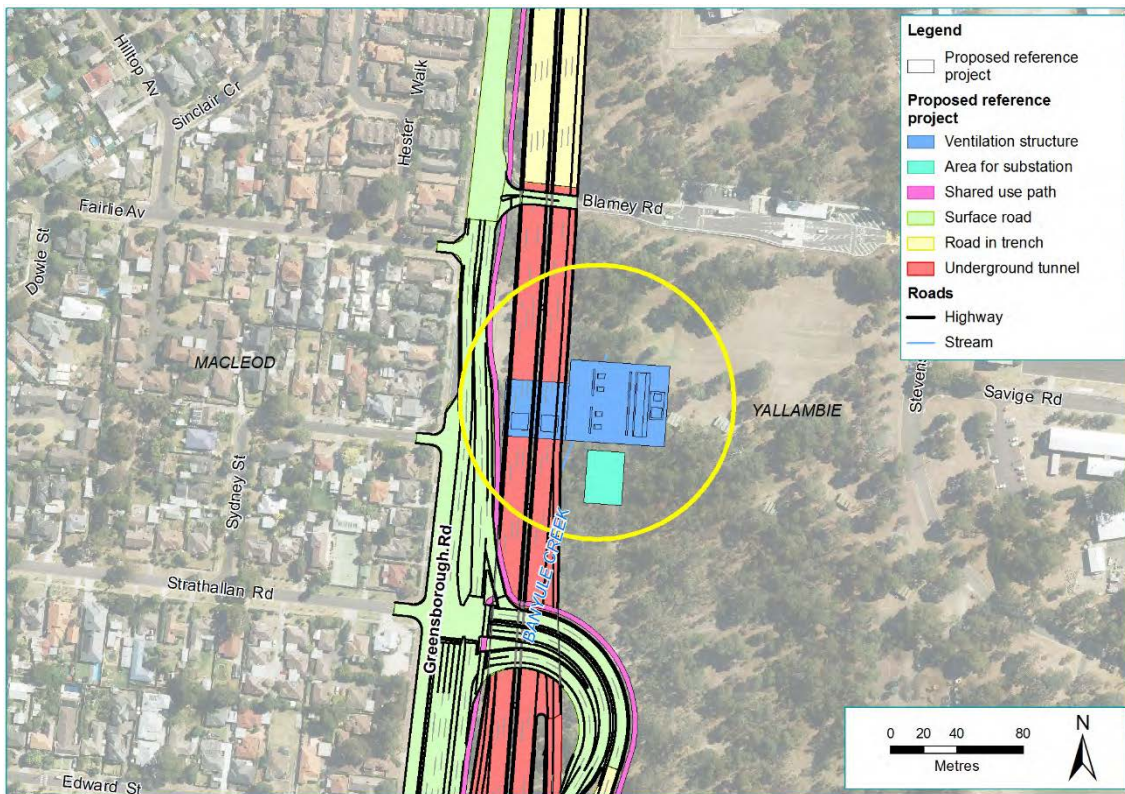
Proposed location of ventilation structure and substation – Northern portal
